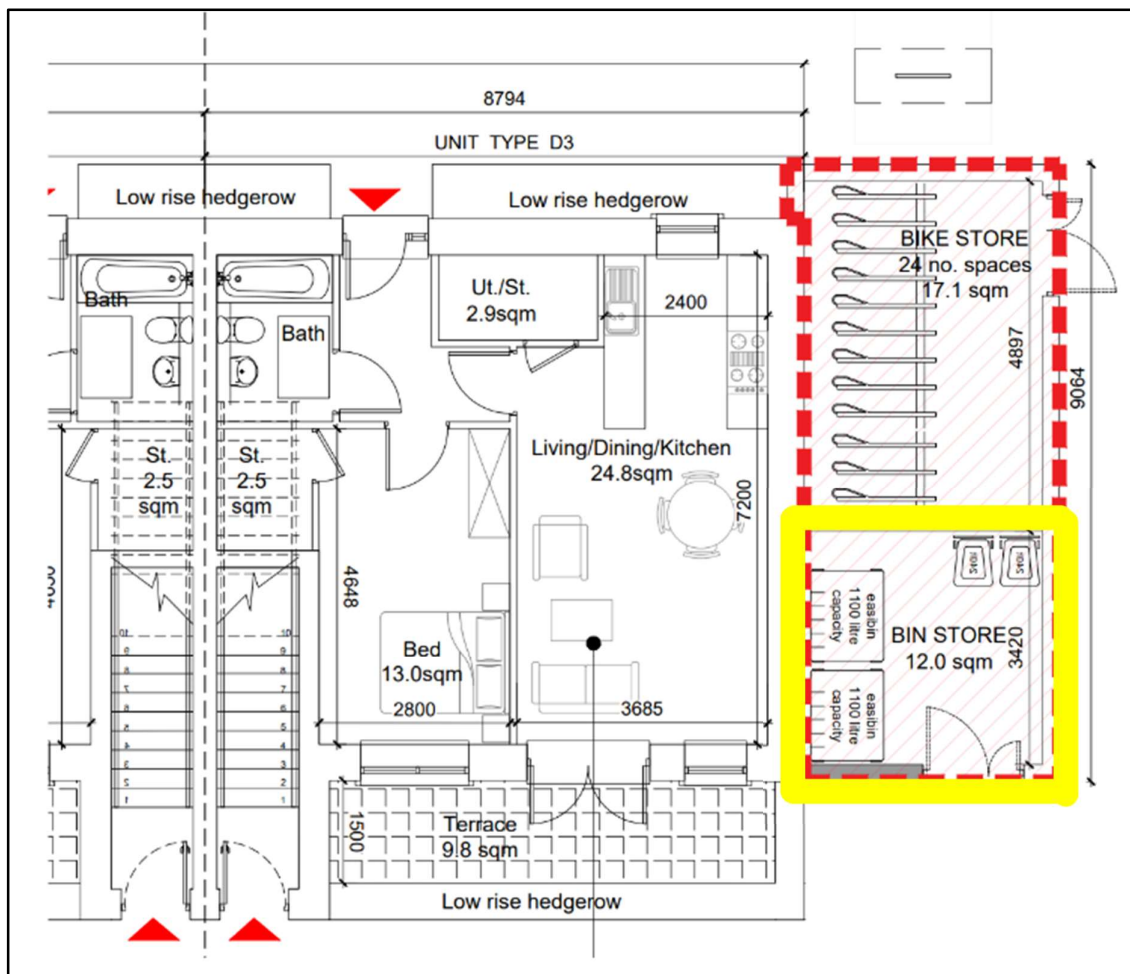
Location and internal layout of Waste Storage Area for Duplex Block D (Yellow) (MCORM, 2025)
